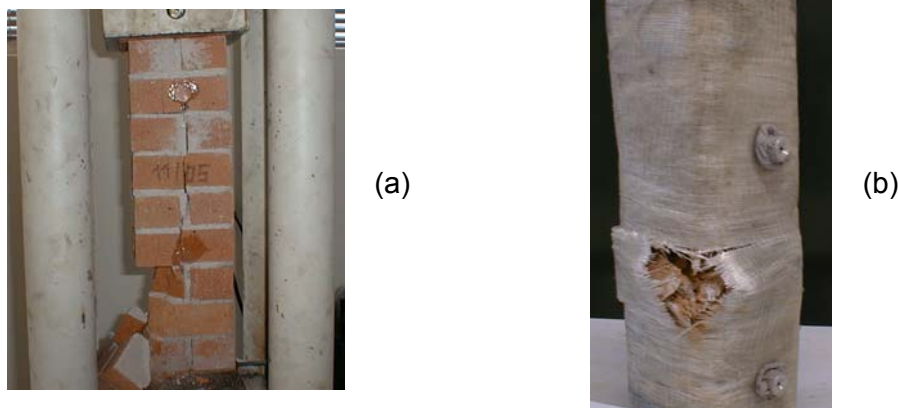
(a) Compressive failure of unreinforced masonry, (b) failure of confining jacket.
